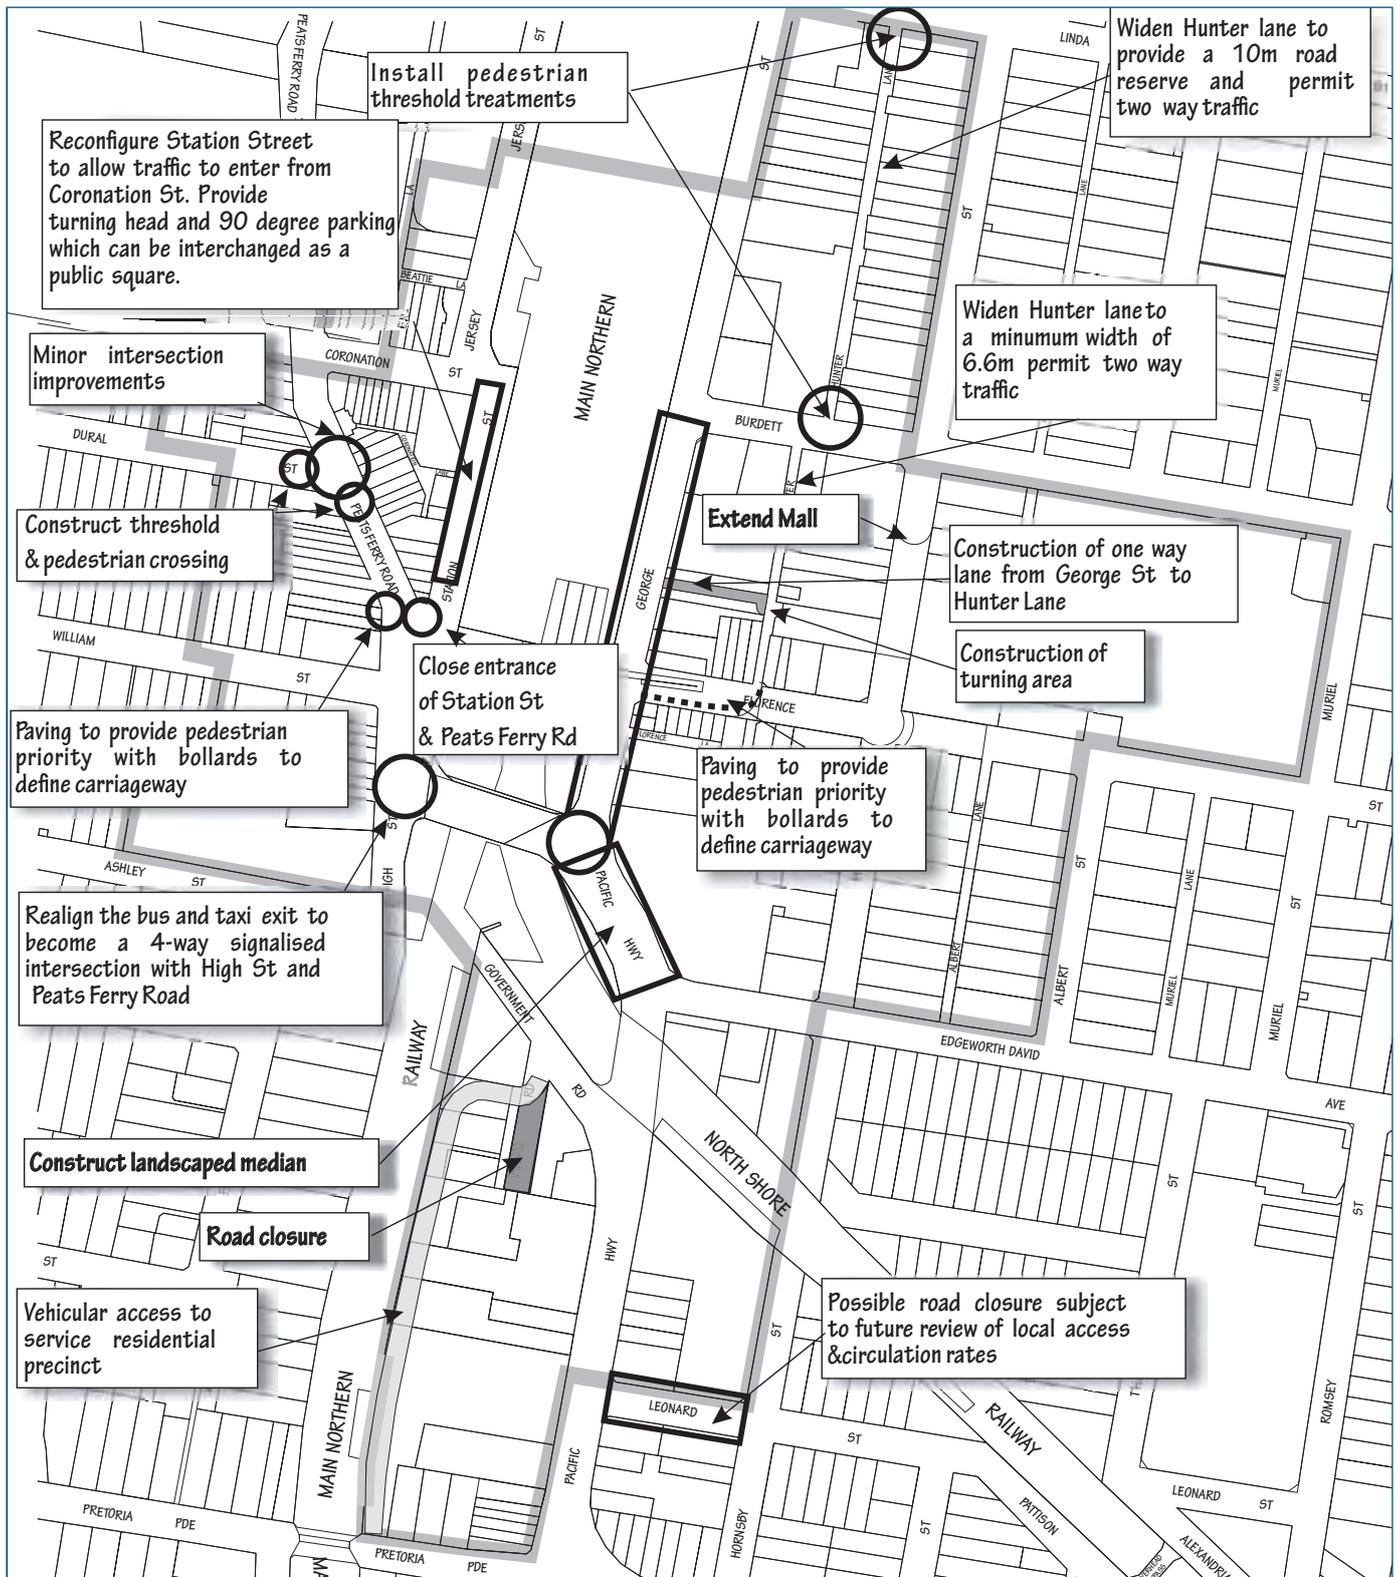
(ac): Traffic Management Improvement Plan - Figure 2.(C)
